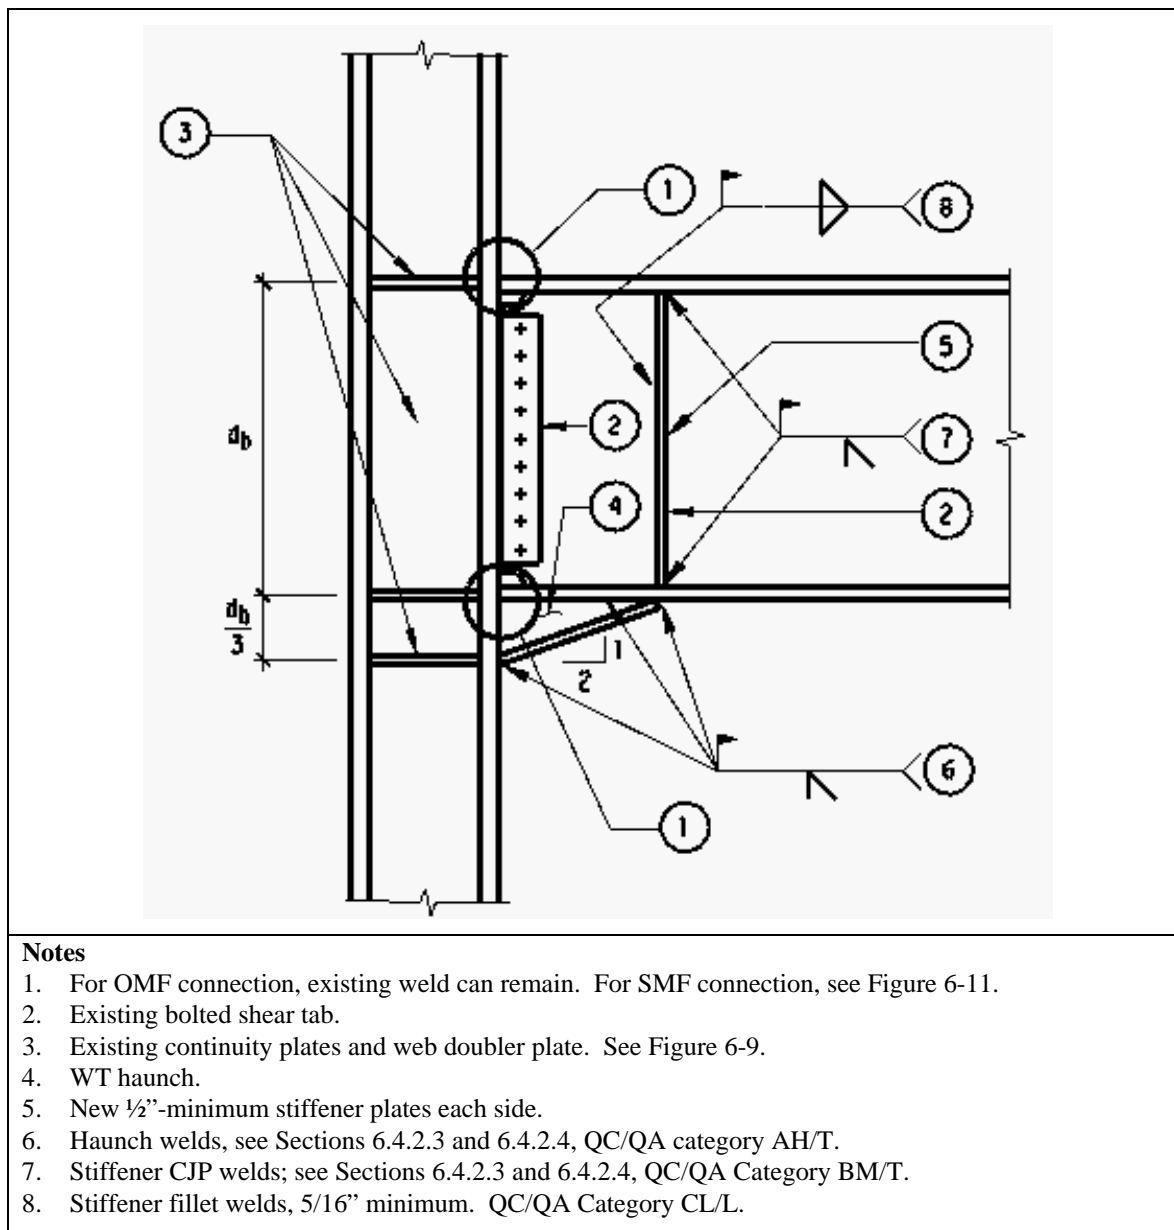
Welded Bottom Haunch (WBH) Connection
